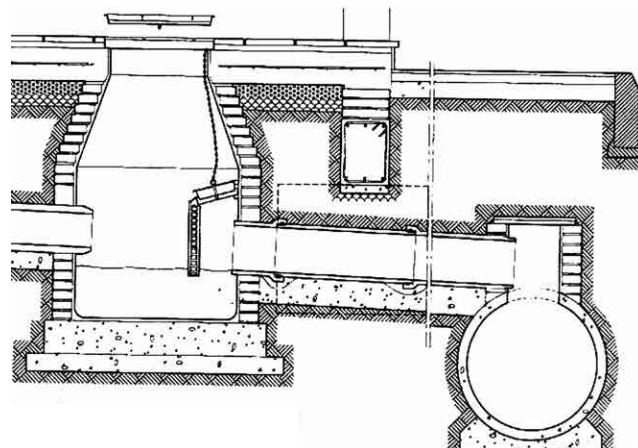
Section of sewer connection with masonry manhole. Design by Fernando Ripollés.
